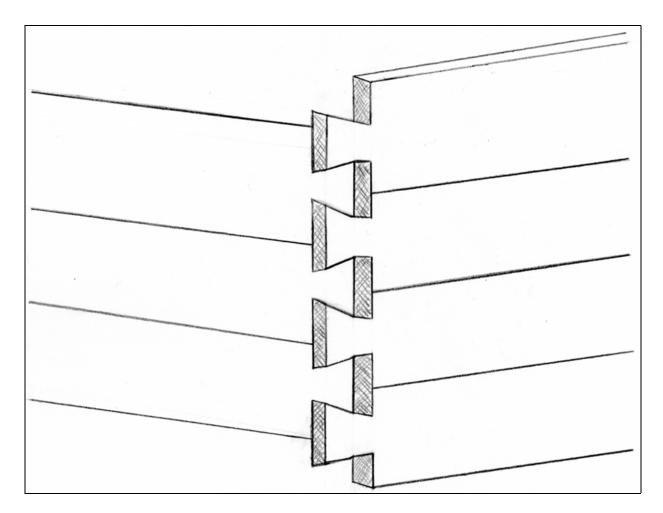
Pièce-sur-pièce* construction consists of dressed timbers joined together by dovetail joinery. Room 1 is of *pièce-sur-pièce* construction (Drawing by Karin Hahn).
